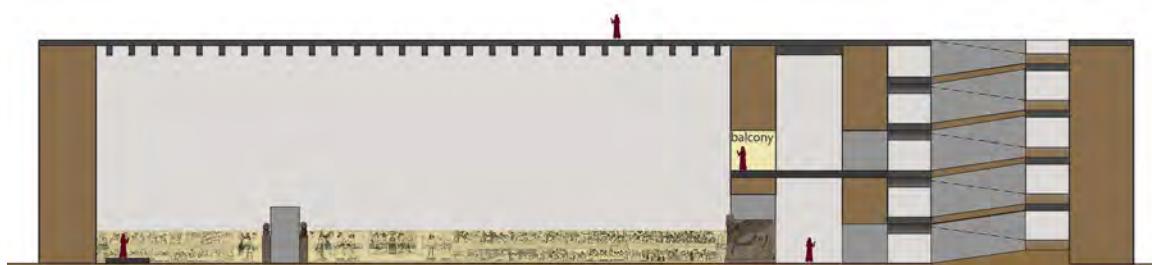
Section through a throne room (Northwest Palace, Kalhu) showing a possible reconstruction of a balcony
